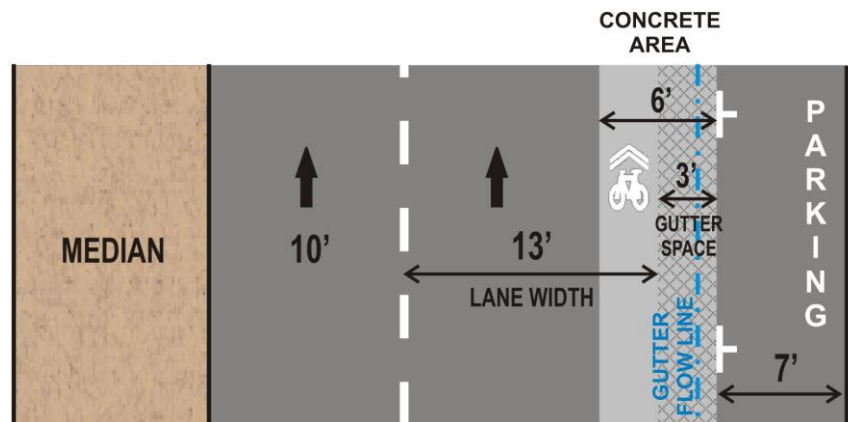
Fair Oaks Avenue Redefined Concrete “Gutter” Space
